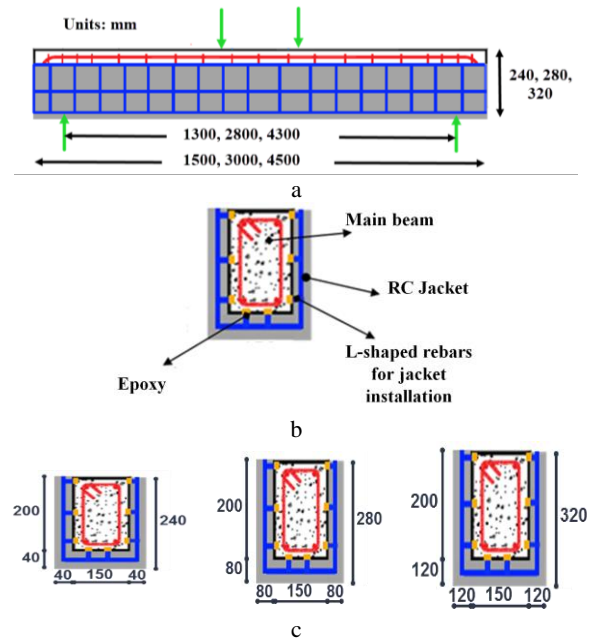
Schematic of retrofitted beams a: Overview of the RC beams b: Different parts of RC jacket c: The sections of retrofitted beams
